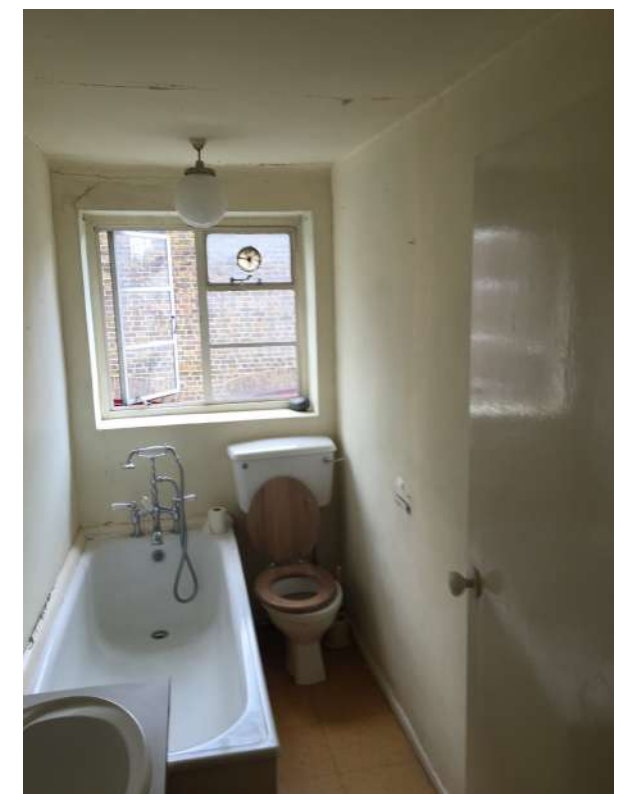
Small bathroom to third floor bedsit which is proposed to be stripped out
